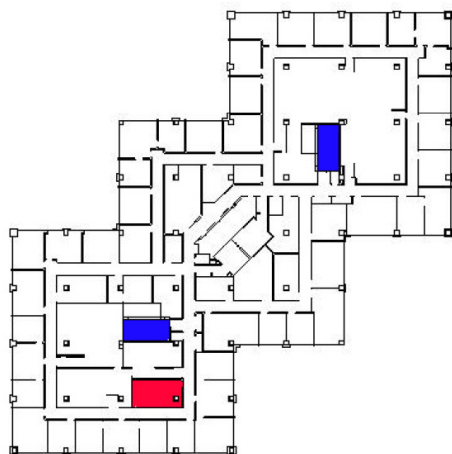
Floor plan of fourth floor NIST north building - my office in red, stairwells in blue.
